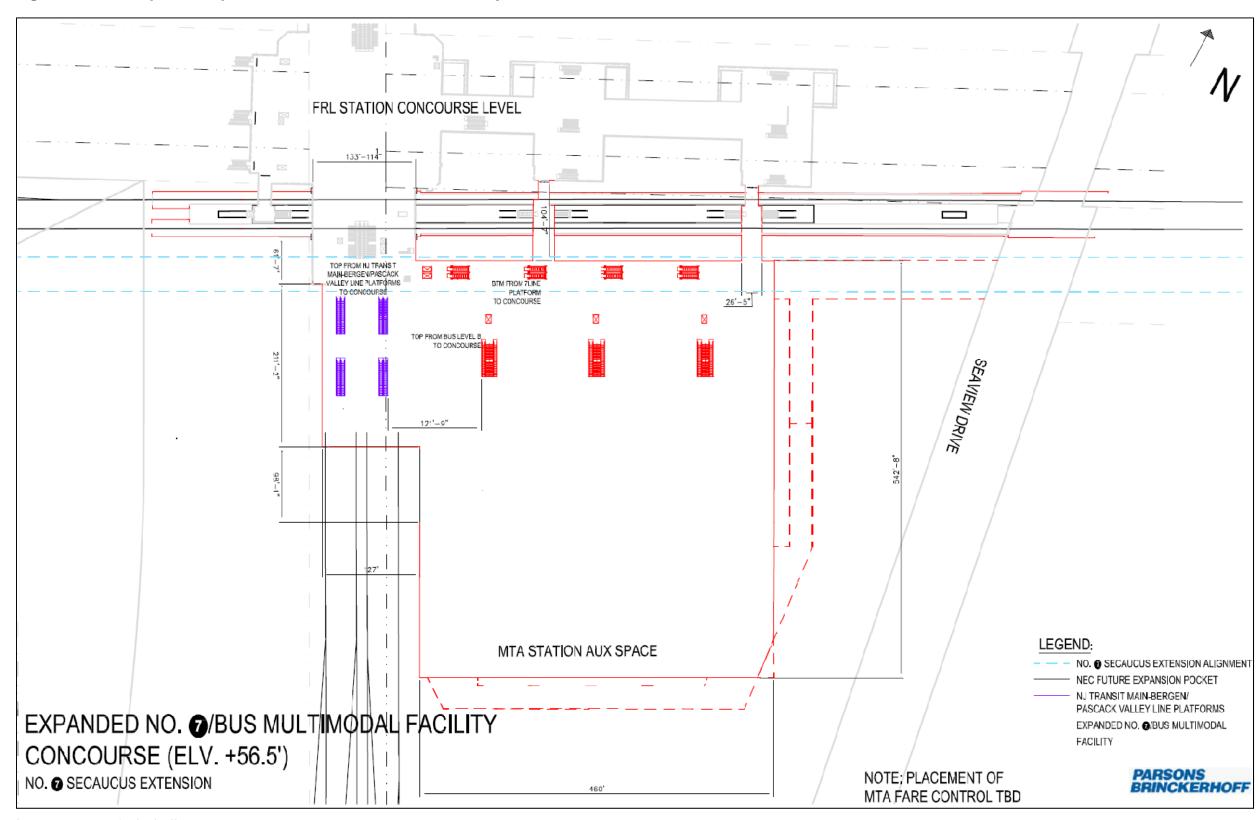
Proposed No. 7 Secaucus Extension Terminal Plan
